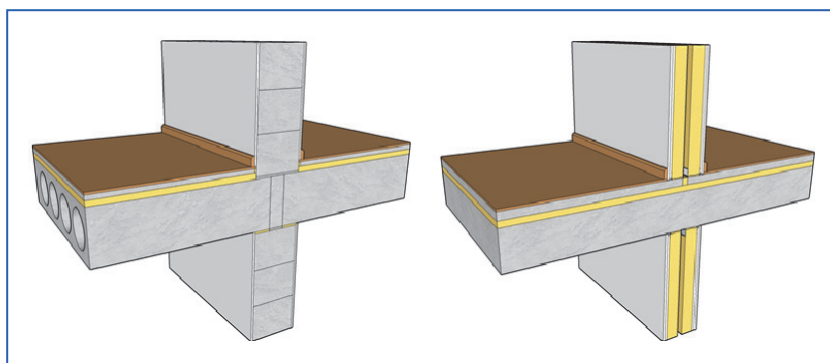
left) Massive wall structure and concrete floating floor on hollow-core panels; right) Lightweight wall structure and concrete floating floor on monolithic concrete slab [[2] - (Estonia)].
